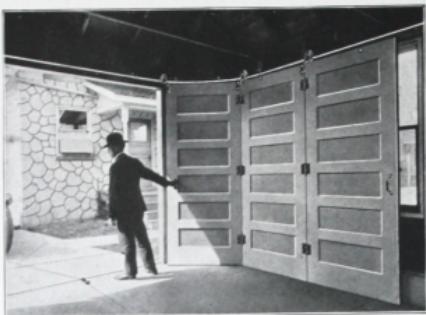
Single car garage doorway having three-door "Round-Runner" equipment - doors in open position.
